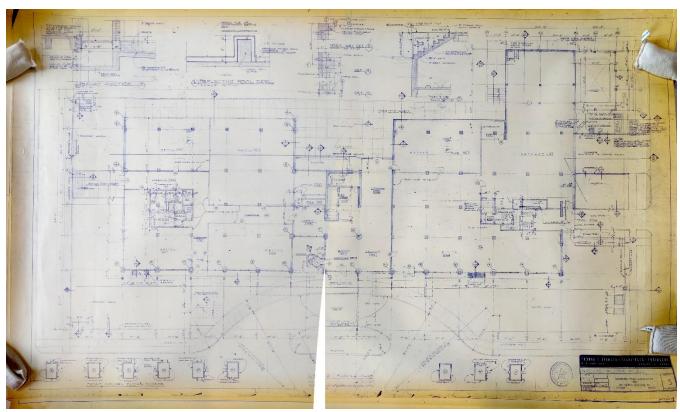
Original blueprint copy of the ground floor plan of Cambridge Tower from the 1964 construction drawing set. Source: Austin History Center, Architecture Collection.
